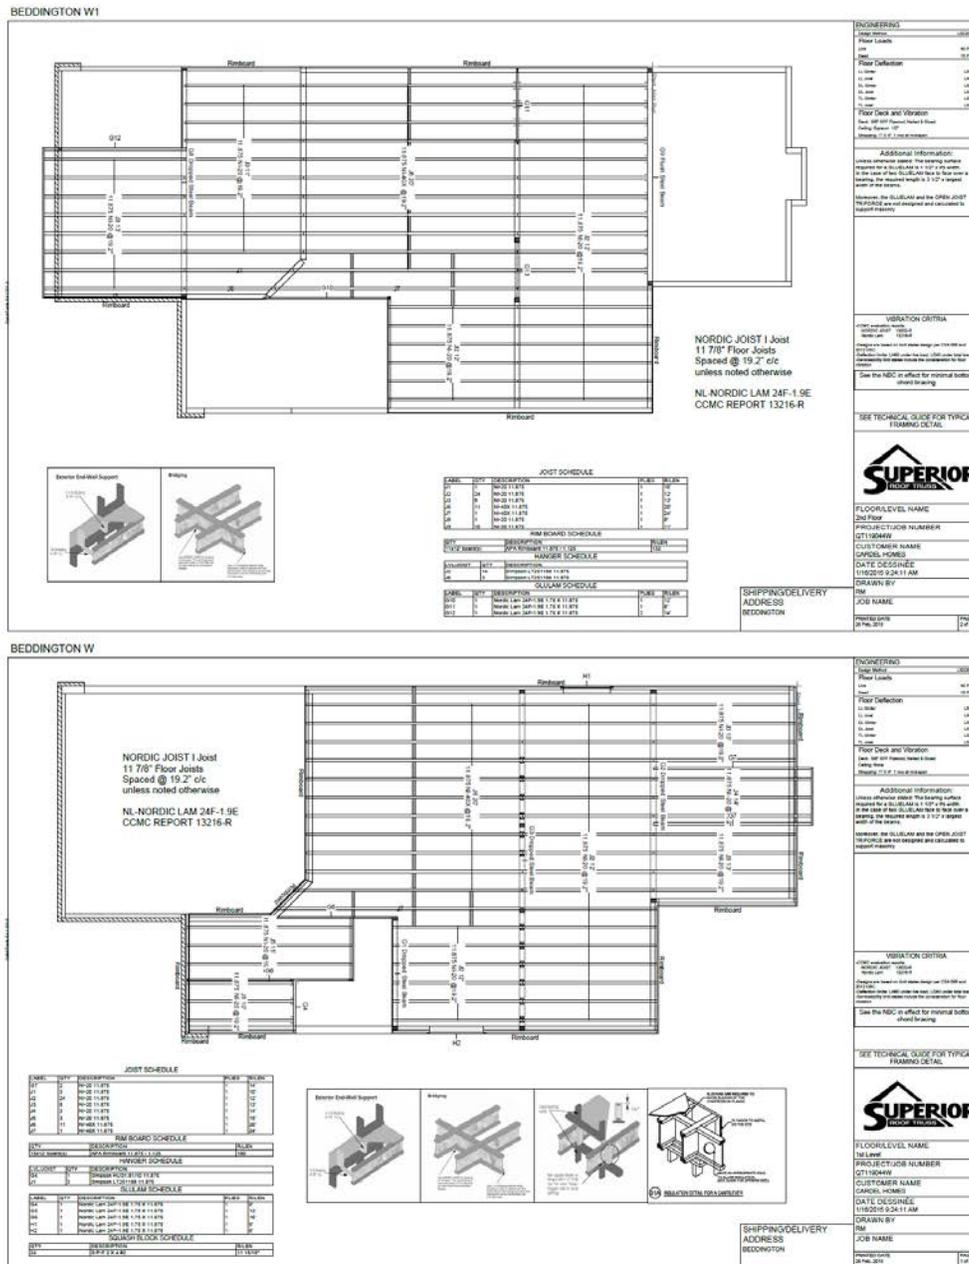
Joist Plan Details to Assist with HVAC Duct Routing
